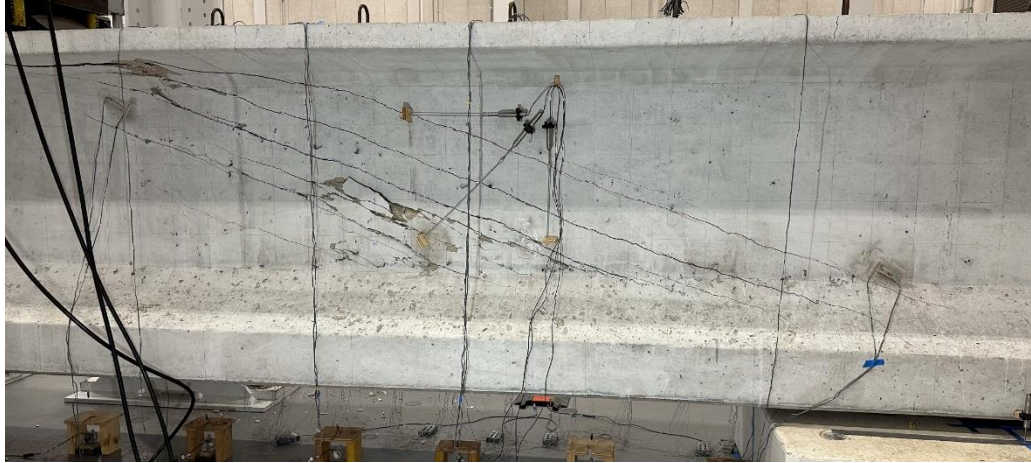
East side of G1 girder at cracking load.
